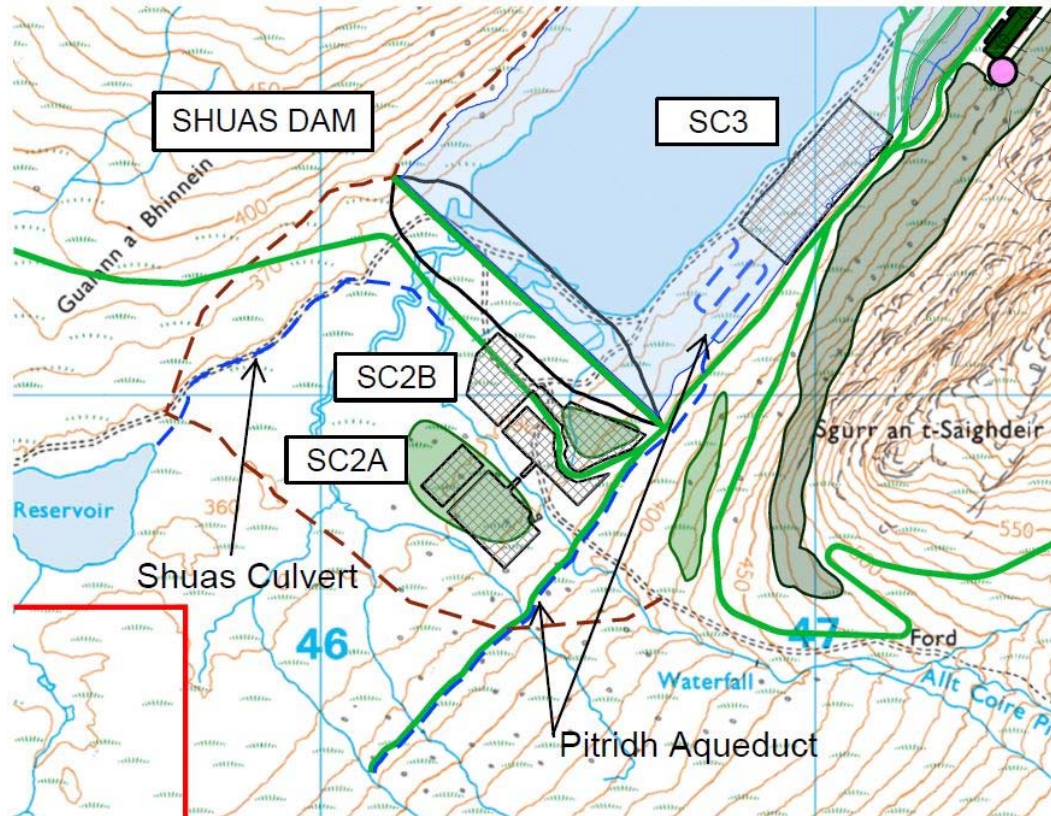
Plan Showing Pitridh Aqueduct and Shuas Culvert
